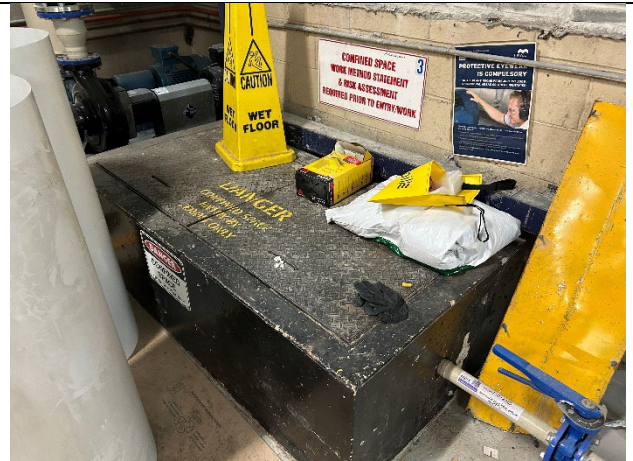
20 Bond Street, Loading Dock, adjacent carpark ramp, sump pump pit
